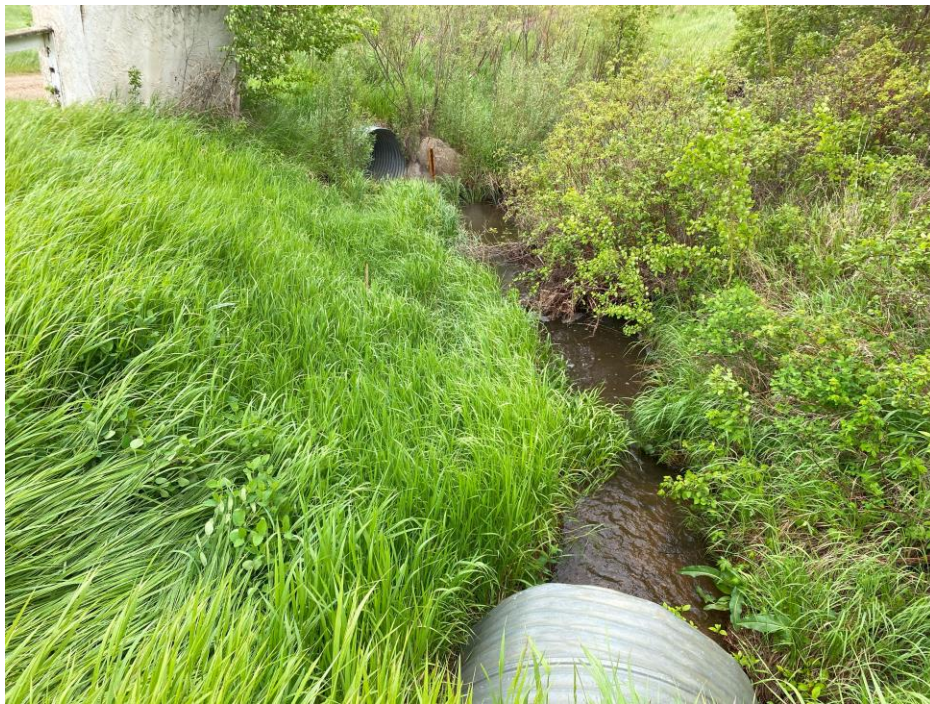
8: Access Rd crossing downstream of the storm sewer outfall.
